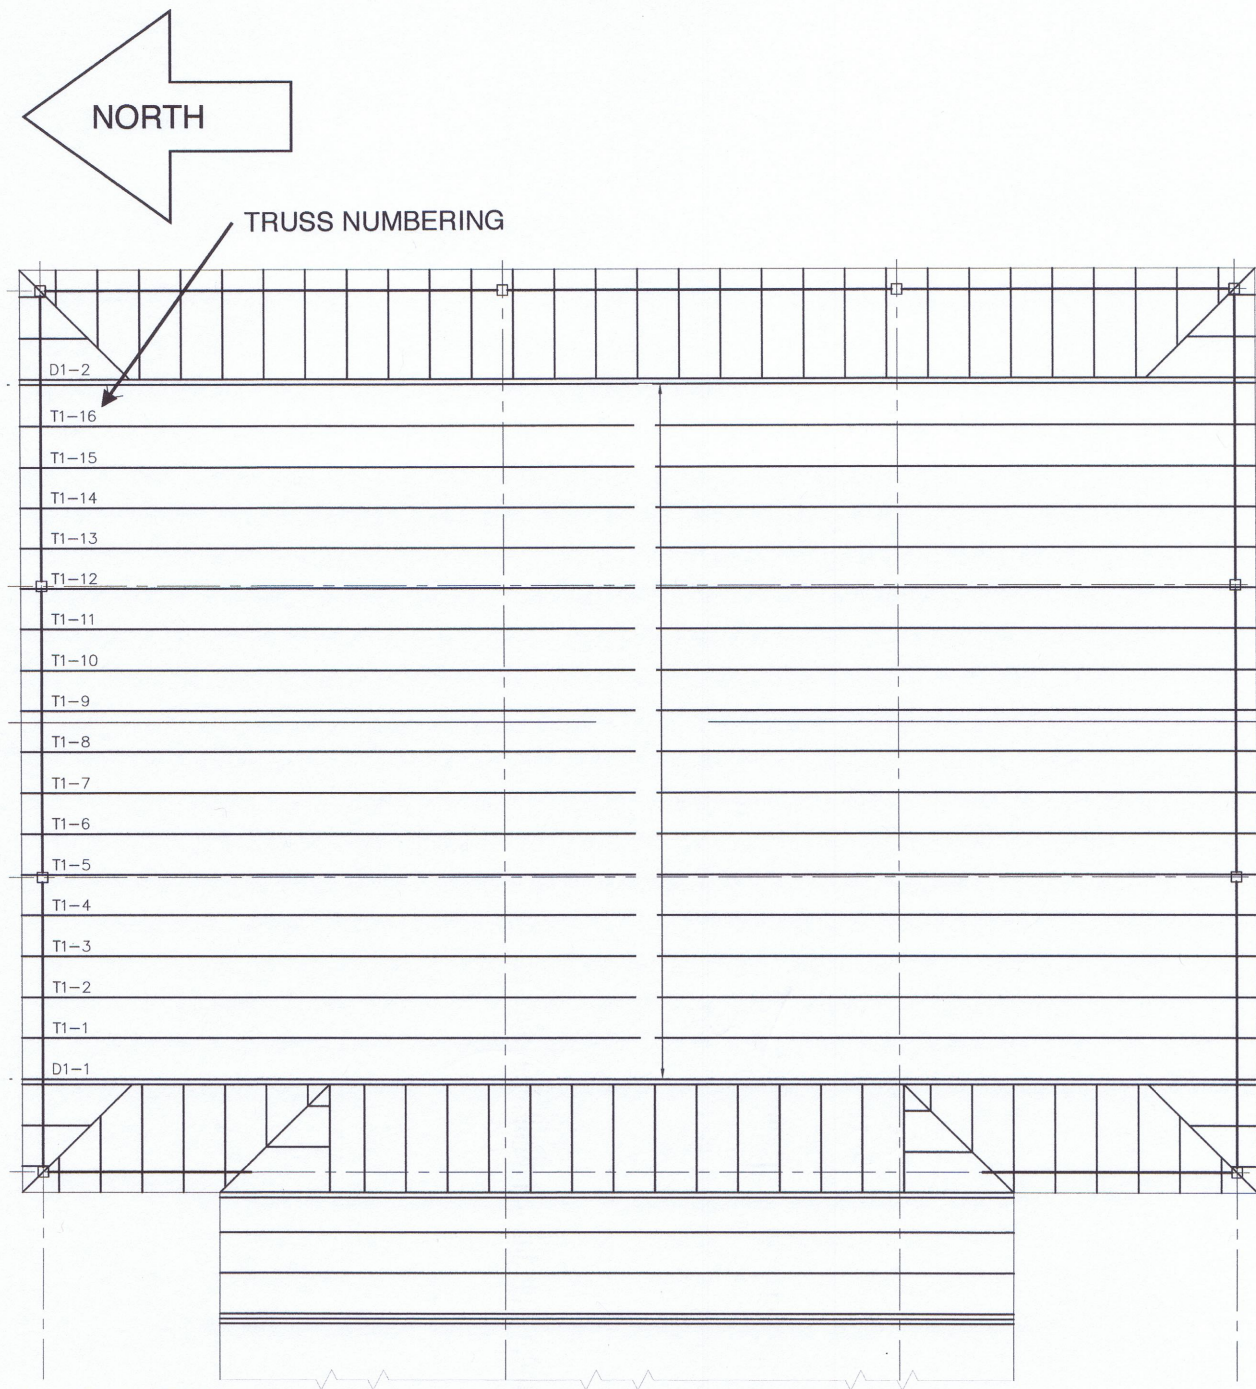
General Plan of Trusses (Linework Copied from RussoBarr Drawing)
